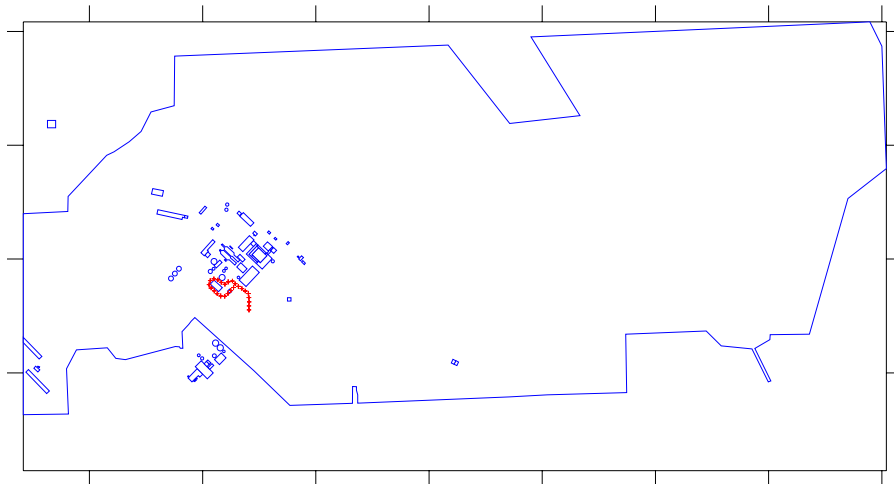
Common Haul Road to Main Entrance and Landfill Road
